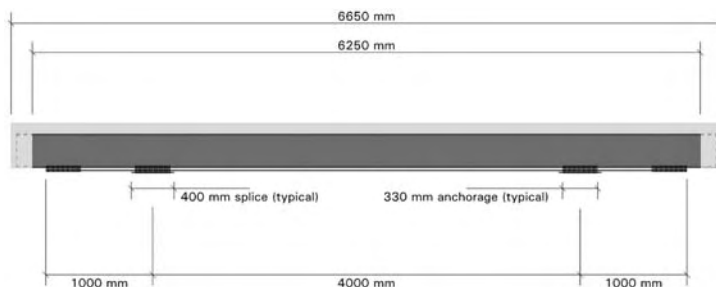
Reinforcement scheme for steel–concrete composite girder (CGAB-I).
